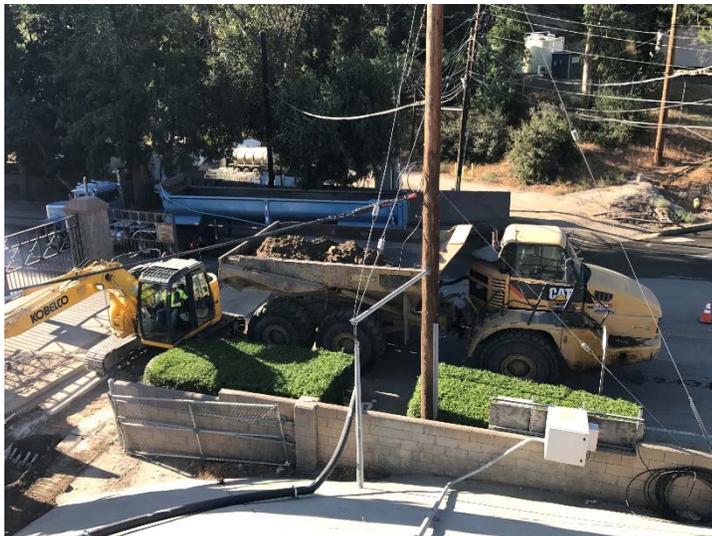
Terminal Basin San Fernando Road Exterior Wall: September 12, 2017
